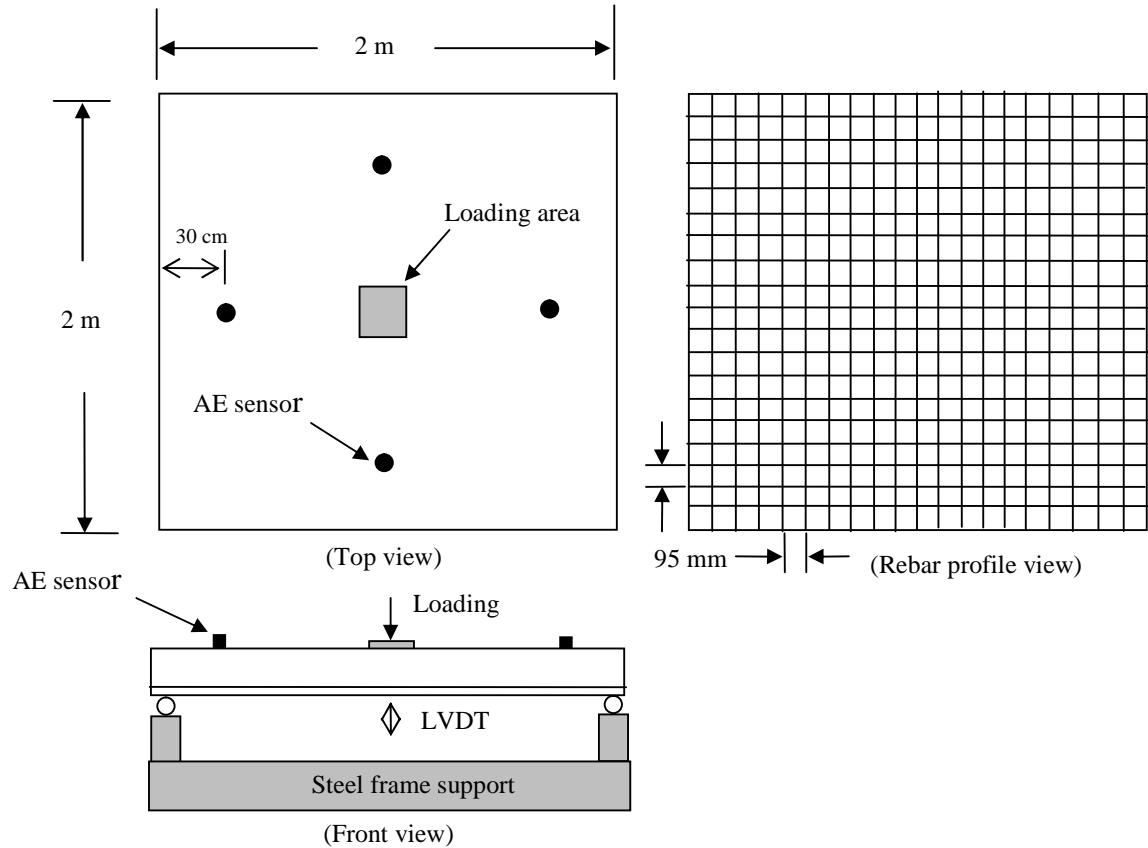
A schematic profile of load test of RC slab and AE sensor locations
